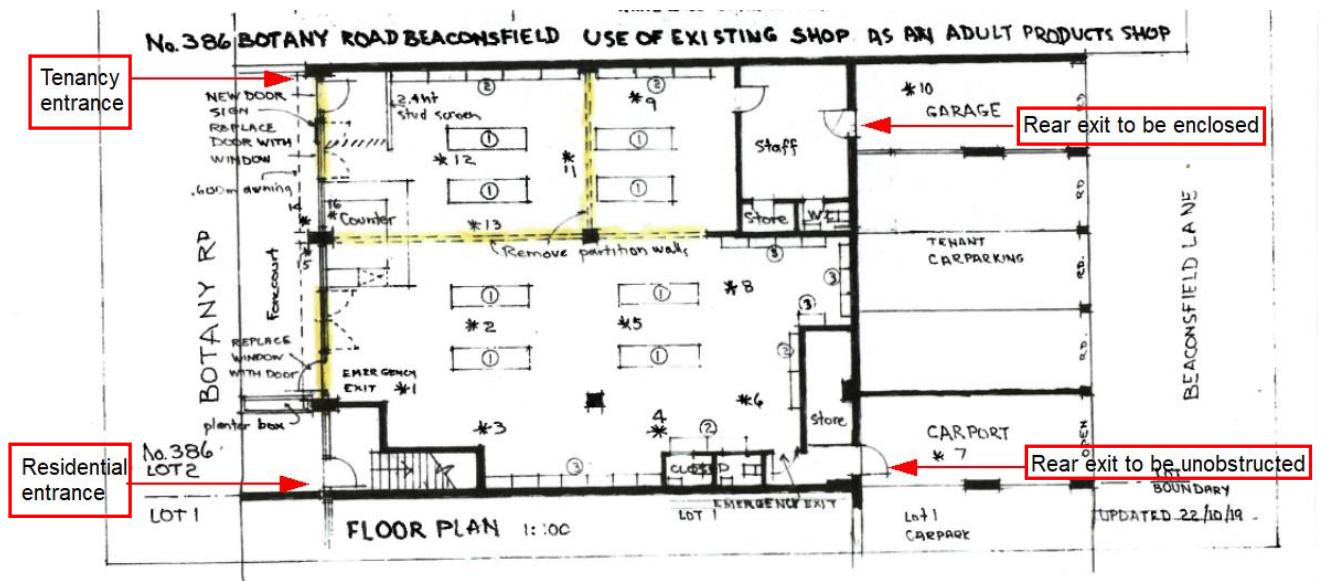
Proposed floor plan, showing the joining of existing two tenancies into one shop and proposed access points.
